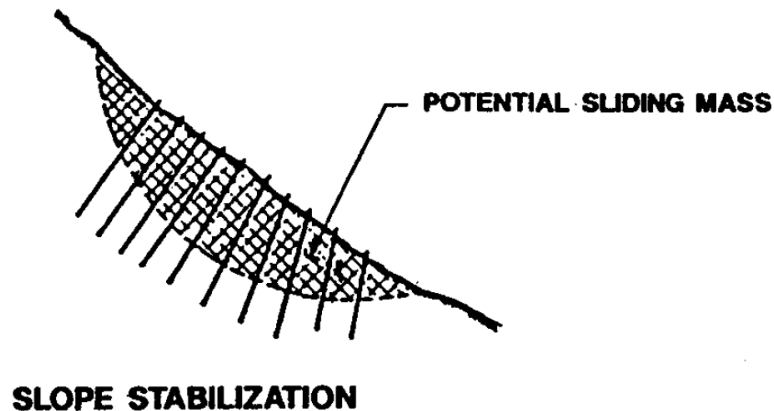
Main application of soil nailing (Abramson et al. 2002).
